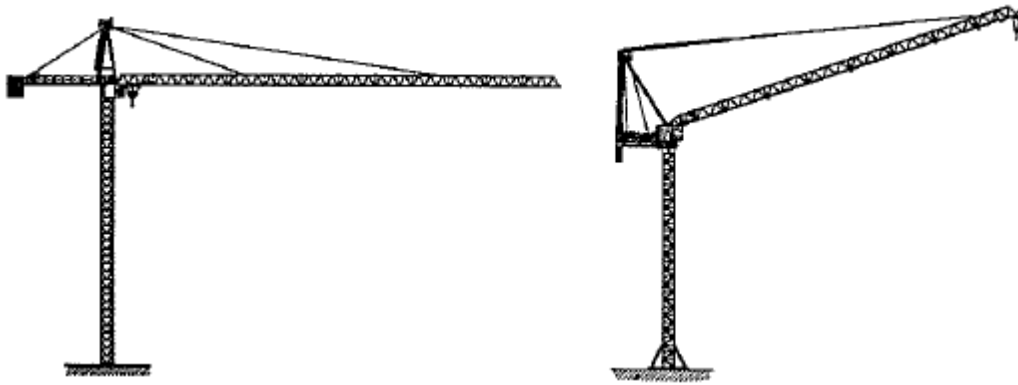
A: Turning tower crane with jib (boom) and turning tower crane with jib and hook trolley
